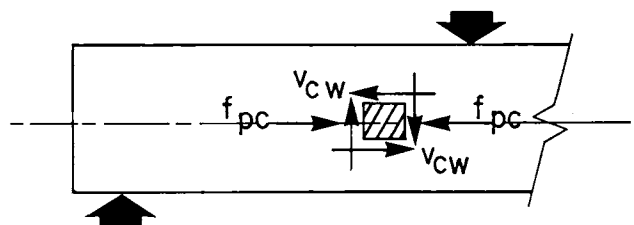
Element at center of gravity of cross section of prestressed concrete beam
